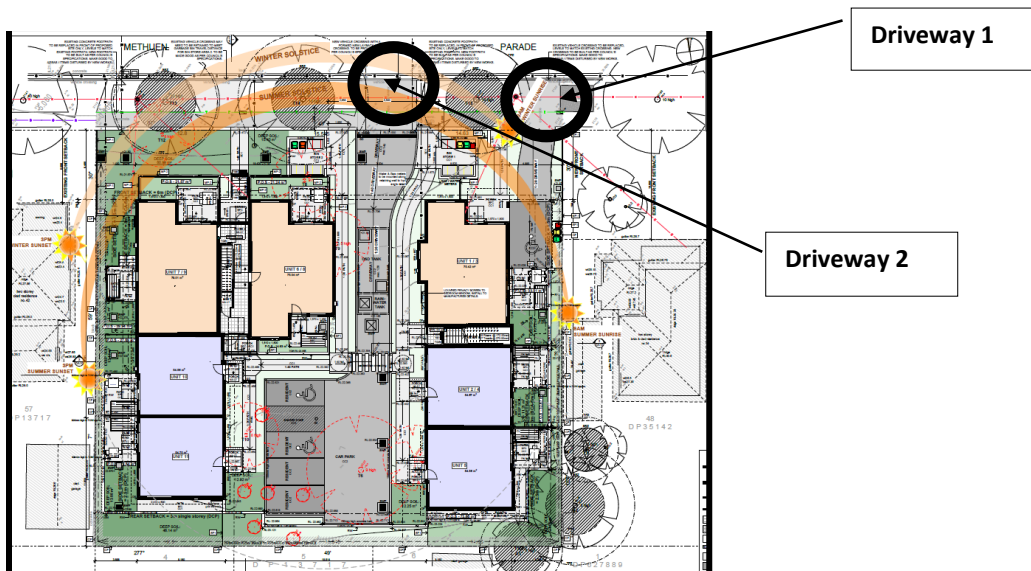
Proposed Driveway location plan (Source DTA Architects)
